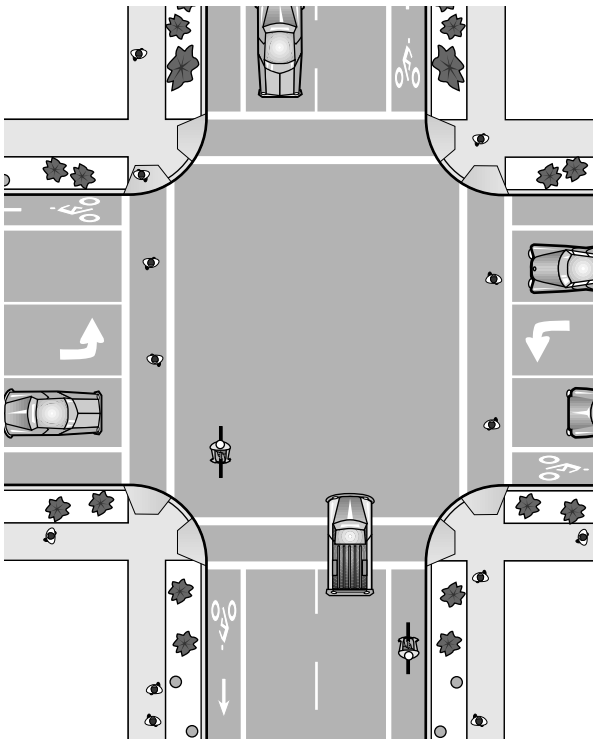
Sidewalks, curb cuts and crosswalks lined up
